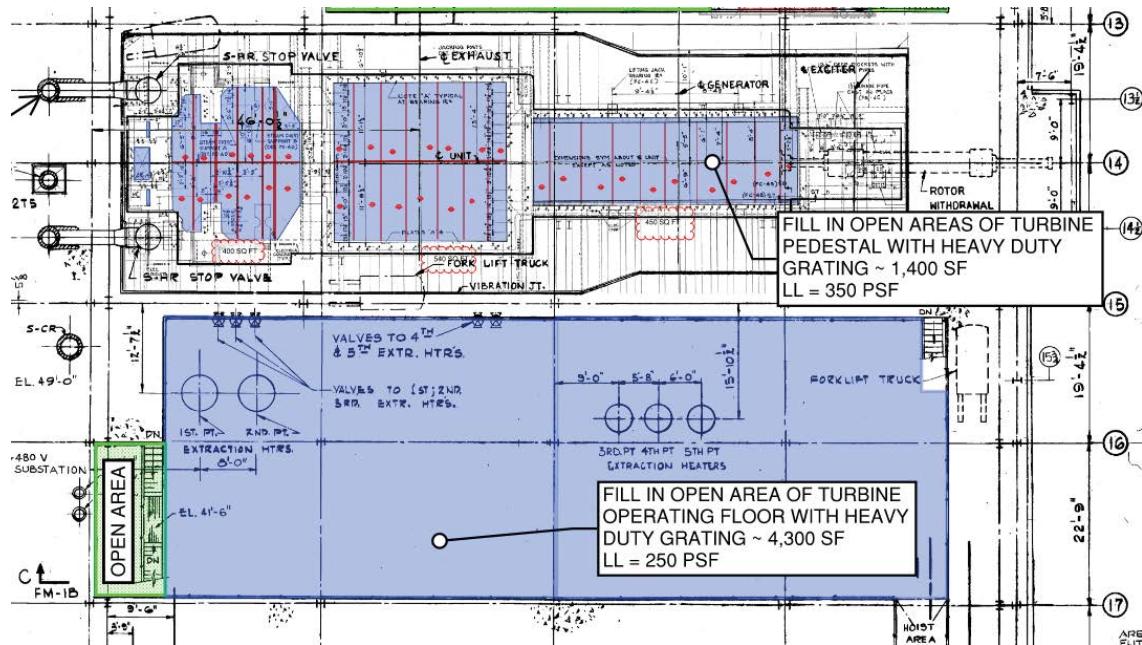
Turbine Building Operating Floor In-Fill Areas
